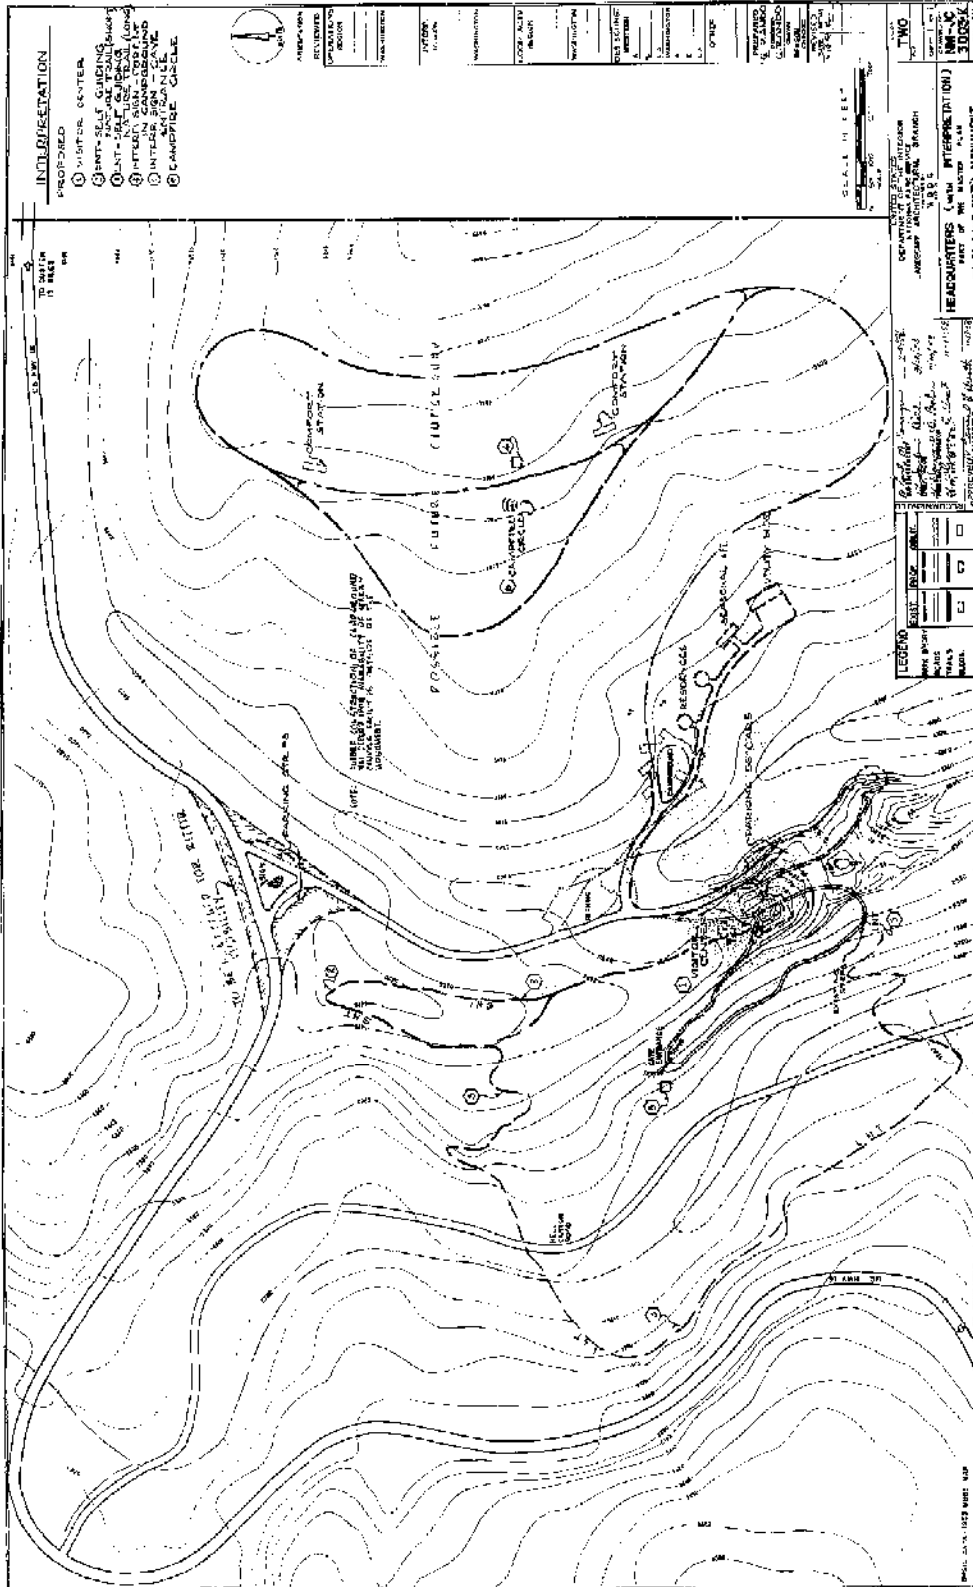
Proposed Site Interpretive Plan, 1957 (Source: NPS 000493)
